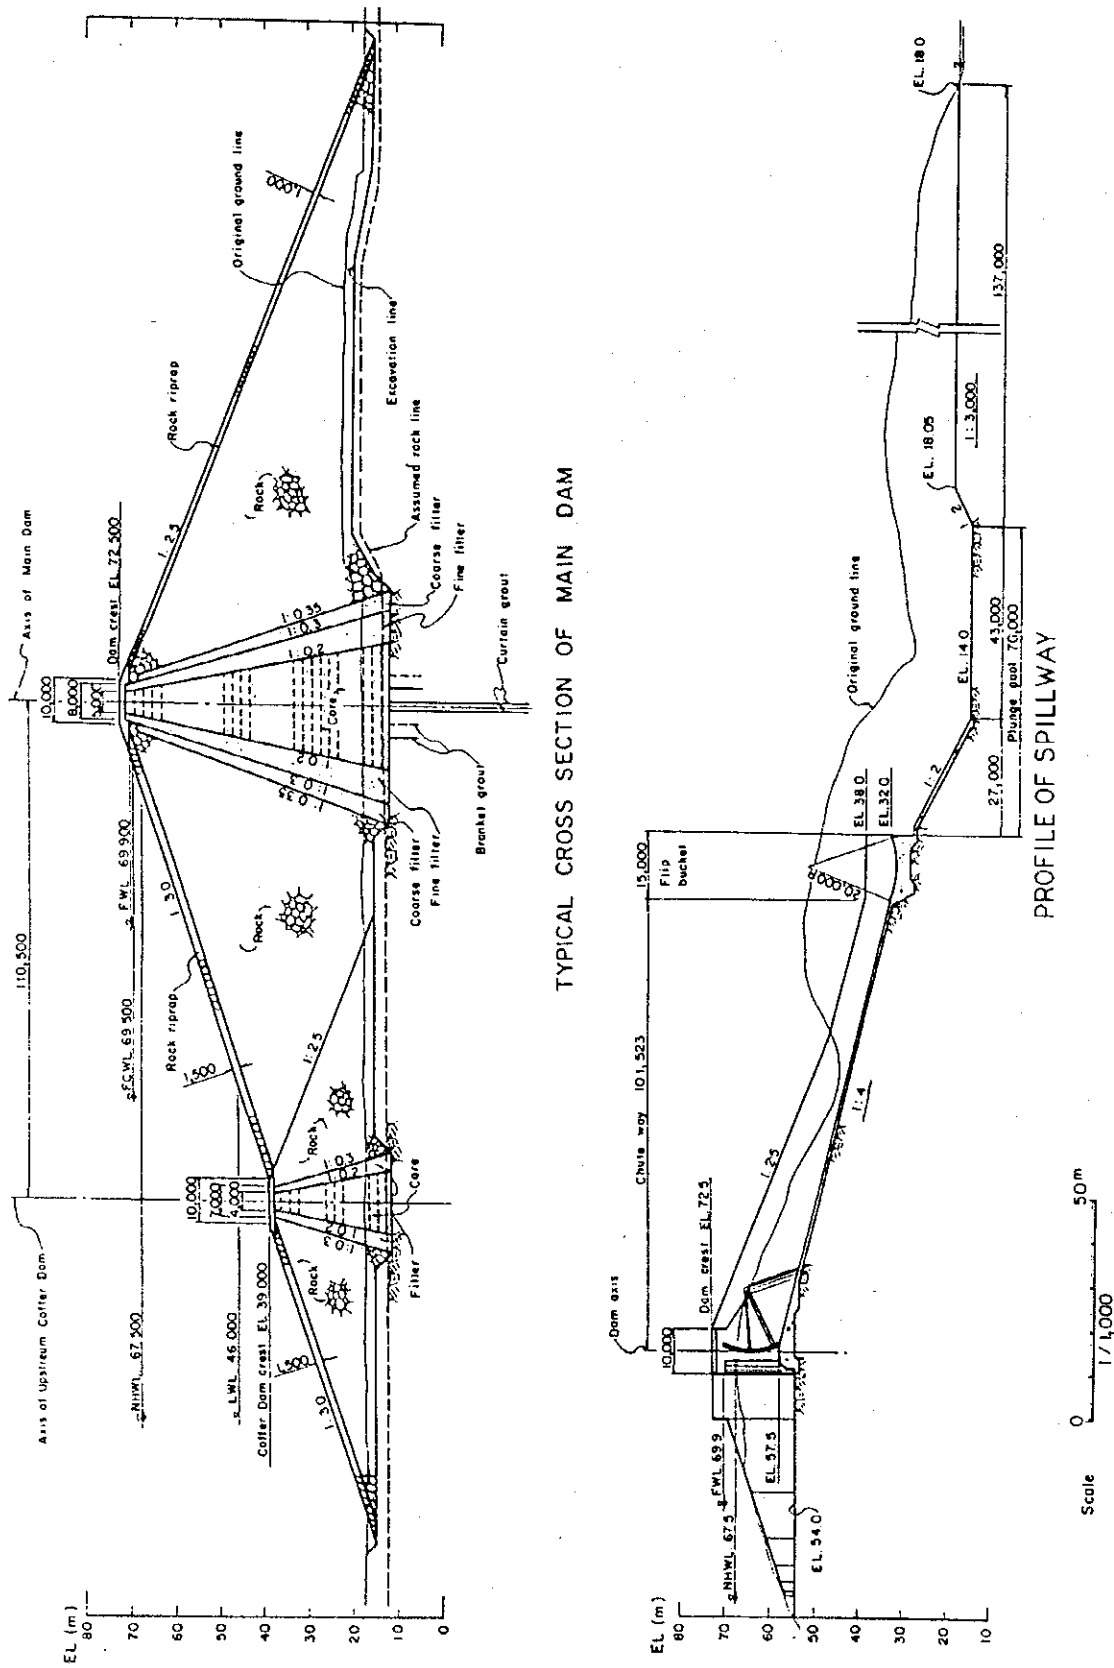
CROSS SECTION AND SPILLWAY OF KARIAN DAM
